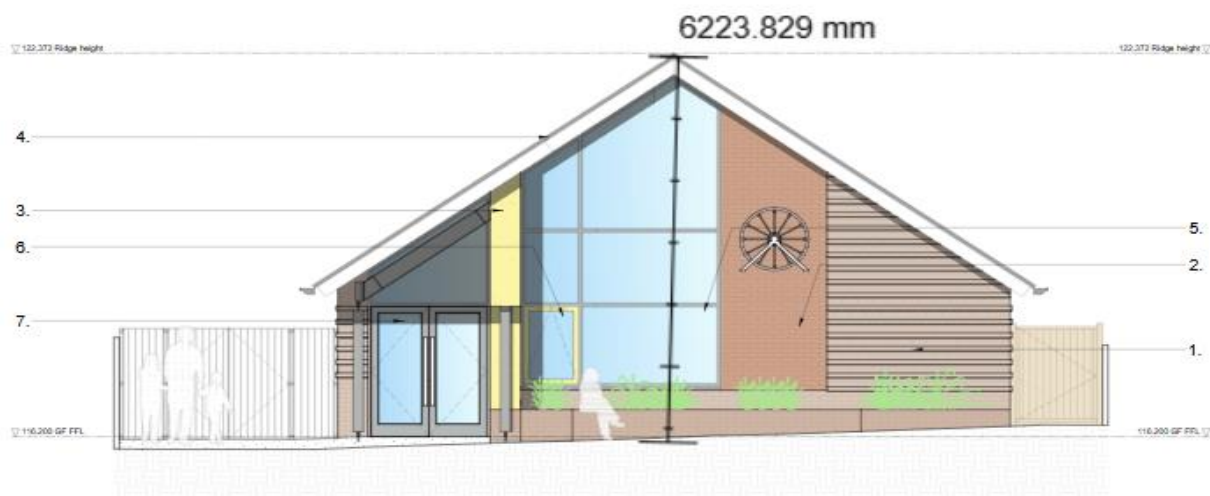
Proposed principal elevation (24101-CO-XX-XX-DR-A-41001)
